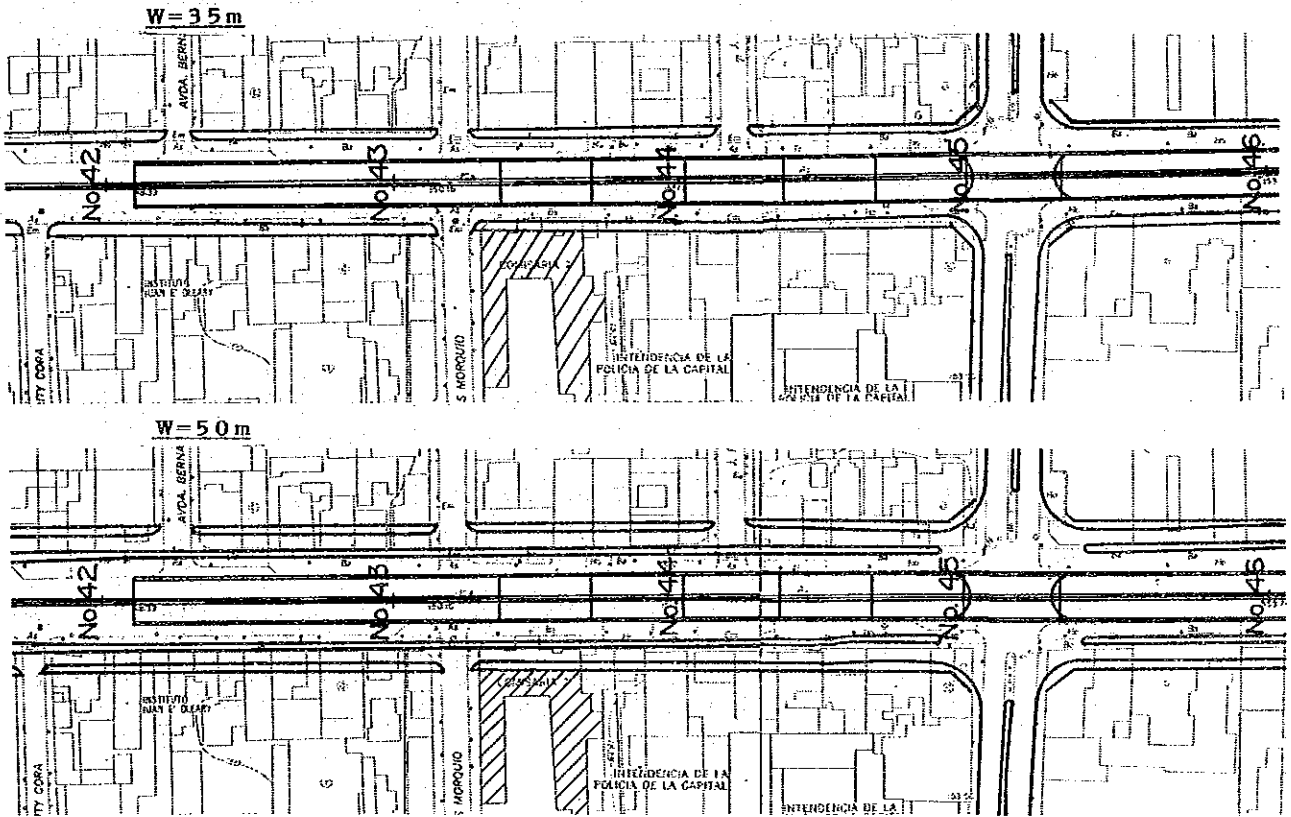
PLAN OF EUSEBIO AYALA AVENUE (SECTION NO. 43+50)
